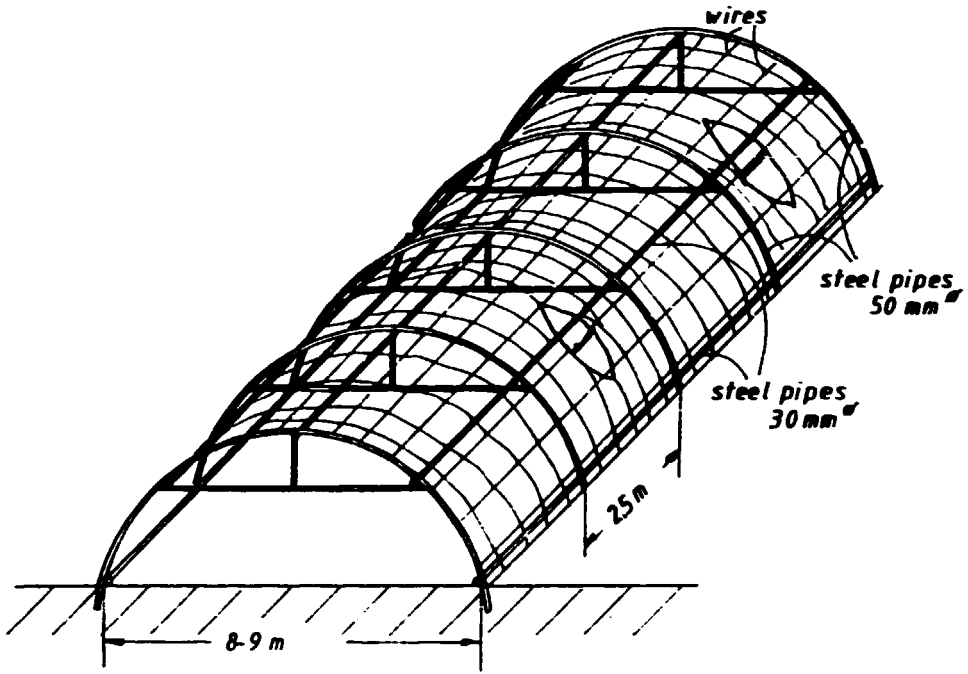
Tunnel greenhouse with conventional ventilation.
